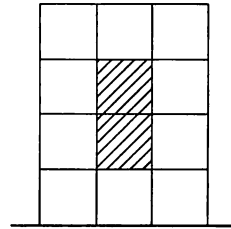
c Frame with two Panel Walls (Specimen-2)
